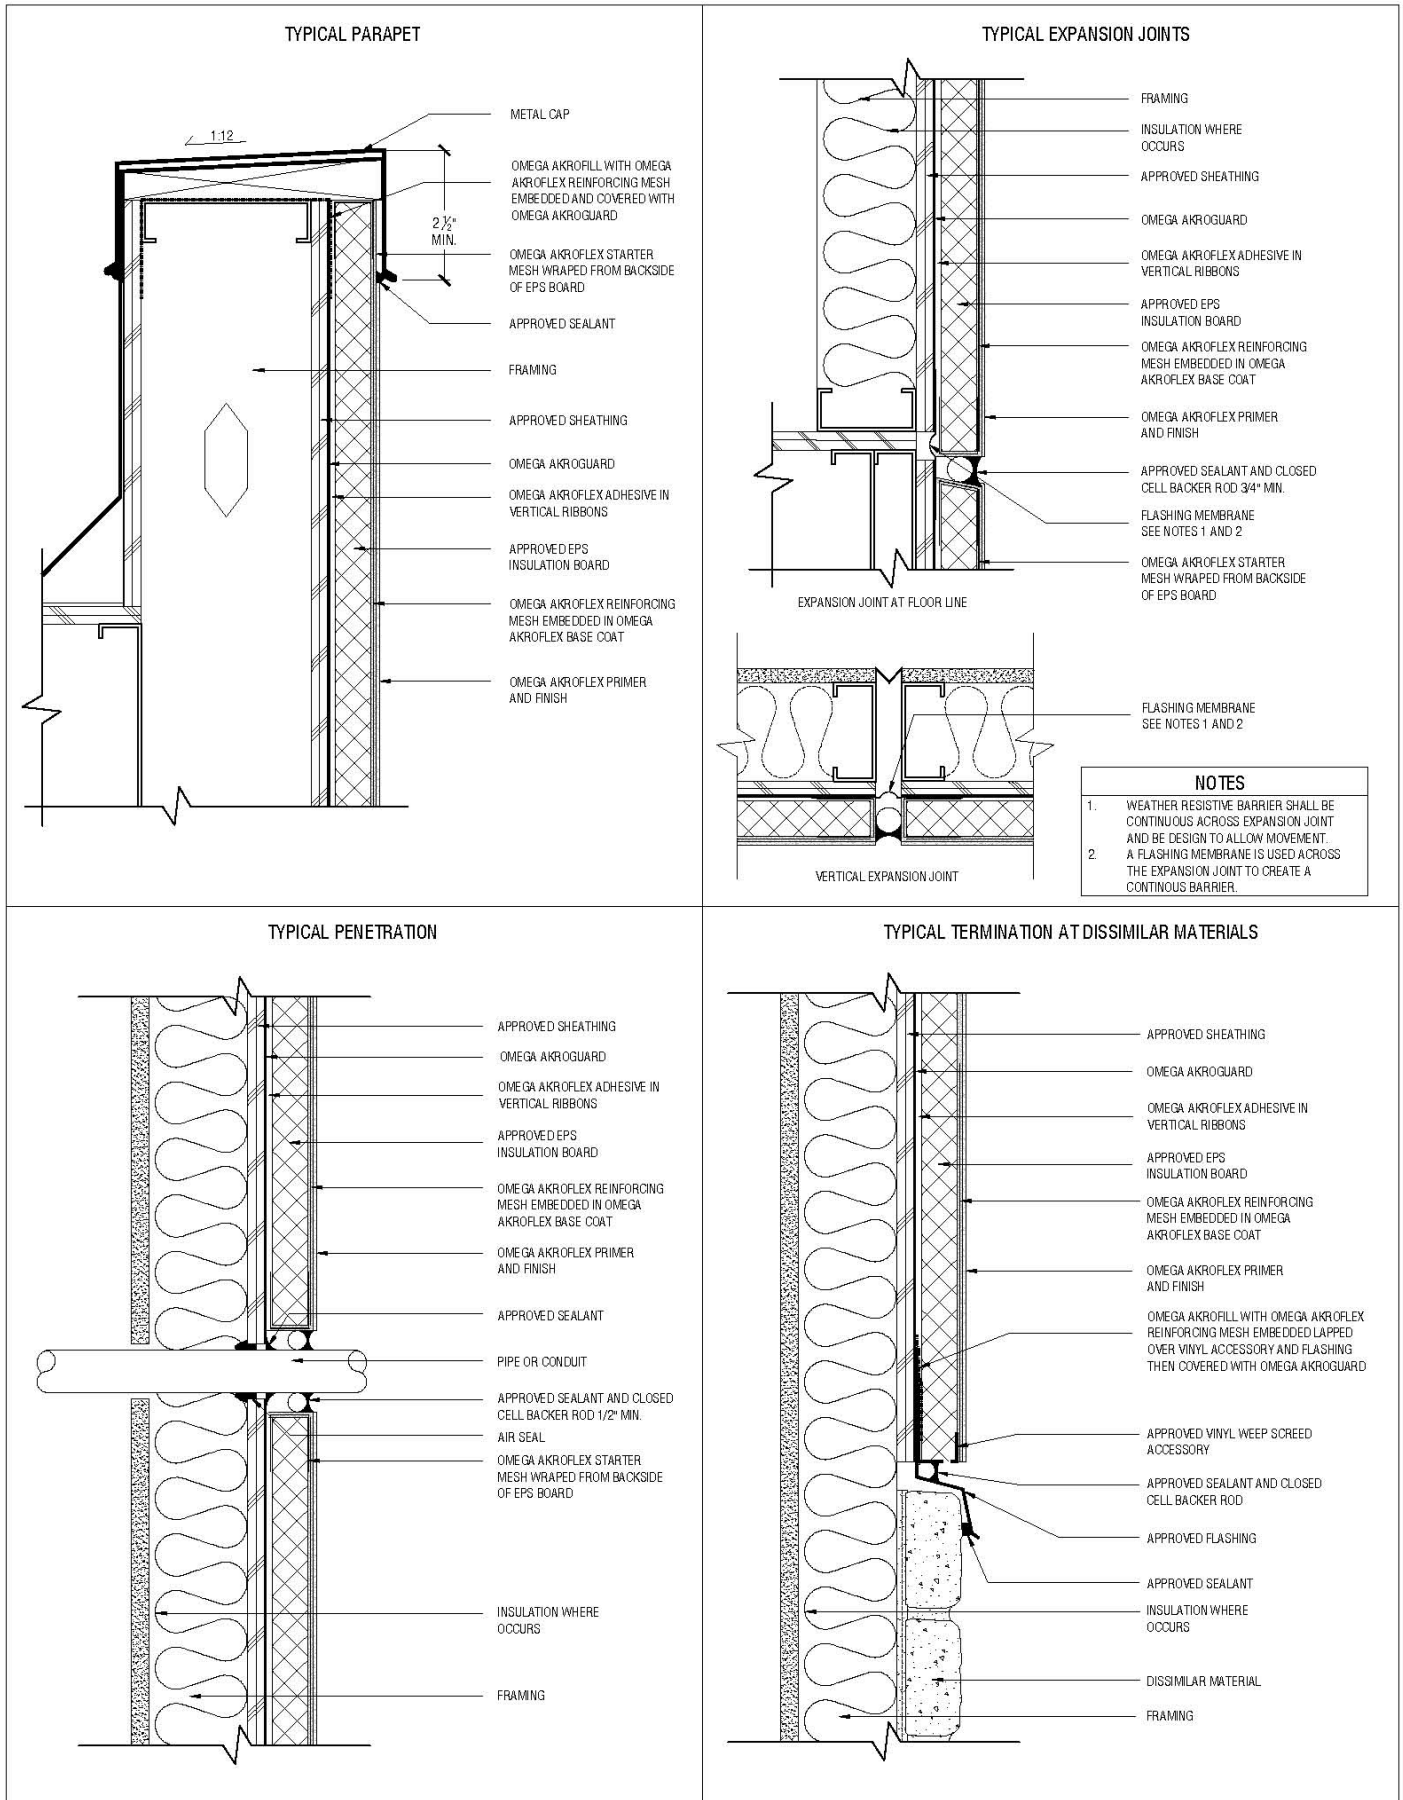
TYPICAL INSTALLATION DETAILS FOR THE AKROFLEX WM+ SYSTEM (Continued)
